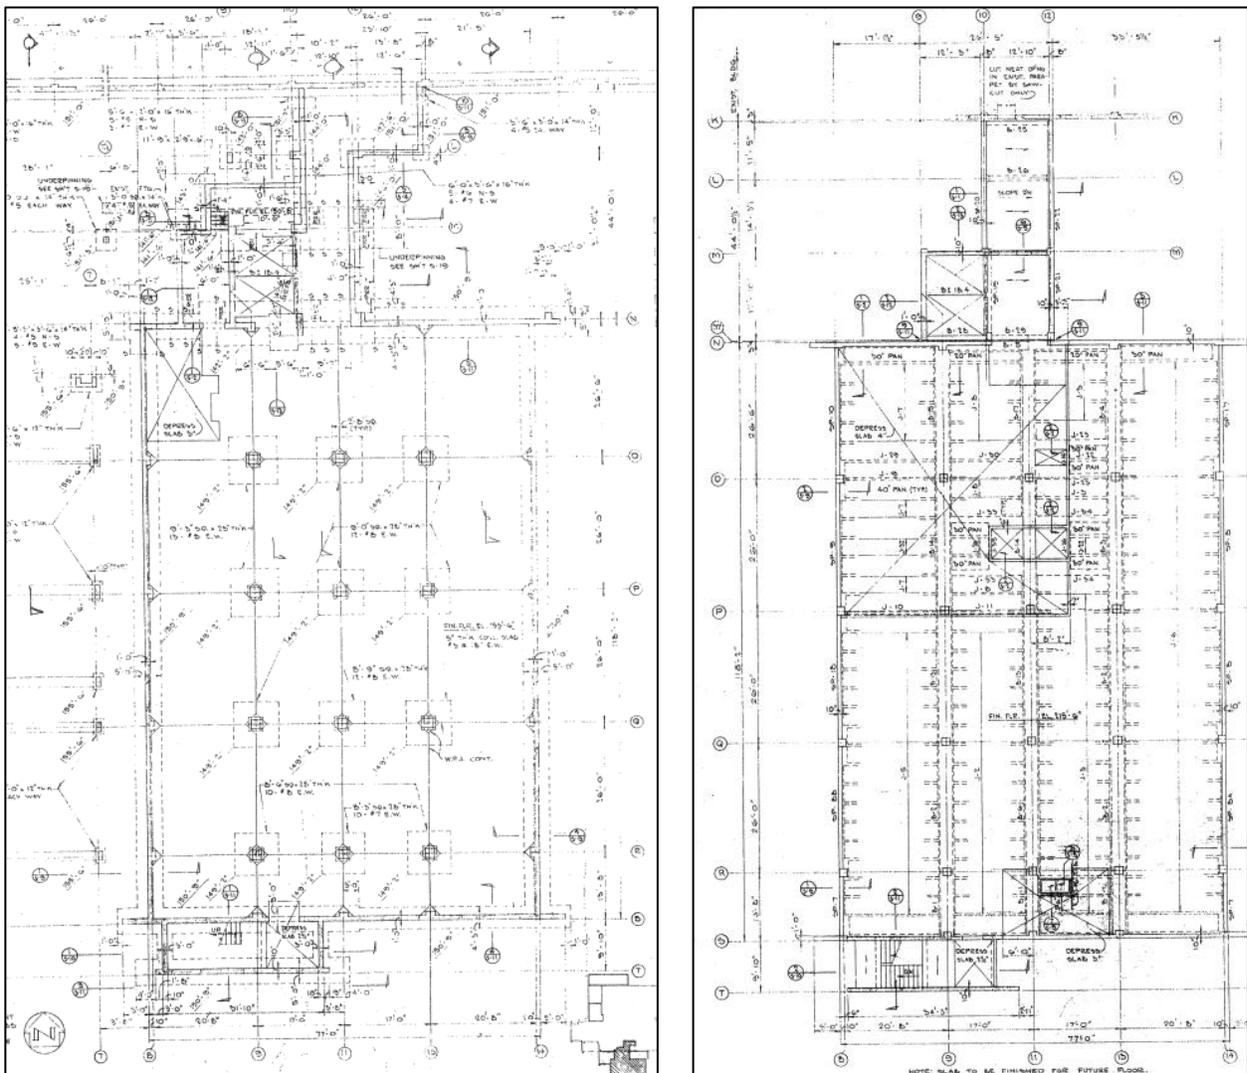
Foundation and Basement Plan (Left), Roof Level Plan (Right) (South Tower and Elevator Tower)
